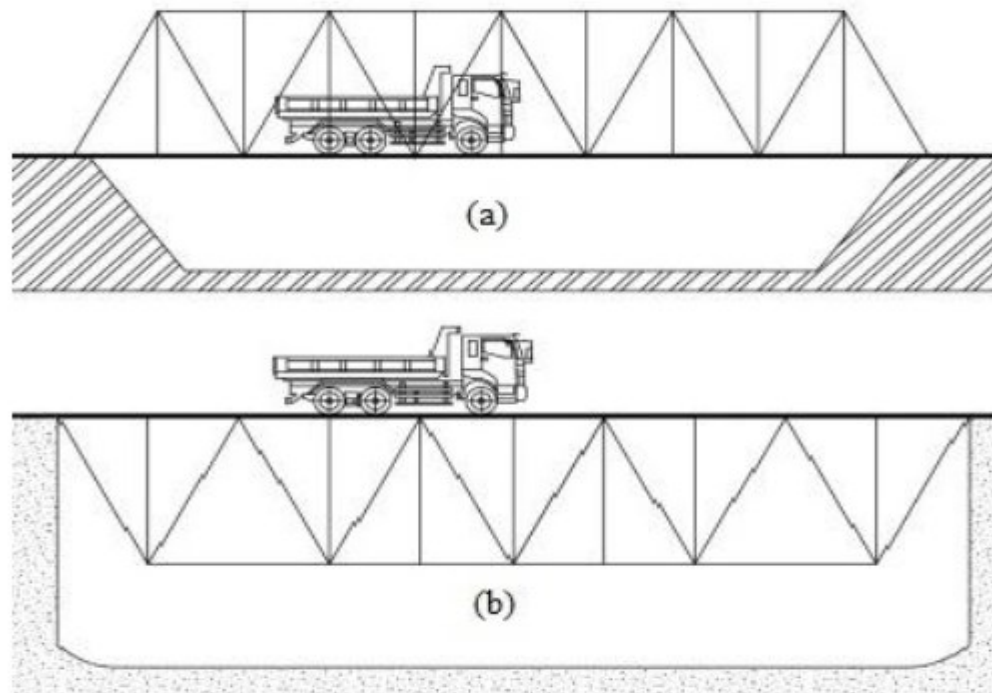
Bridge system (a) Through type truss bridge (b) deck type truss bridge.
